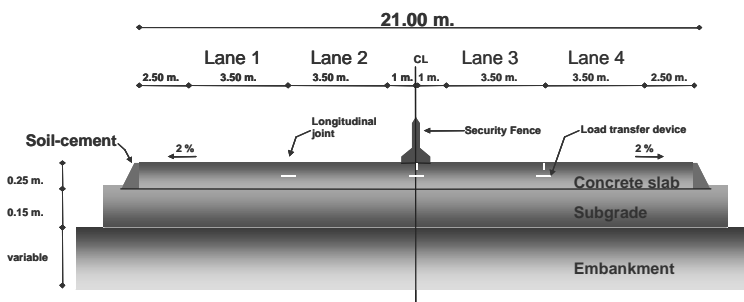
Section view. Embankment, subgrade and concrete layer shown.
